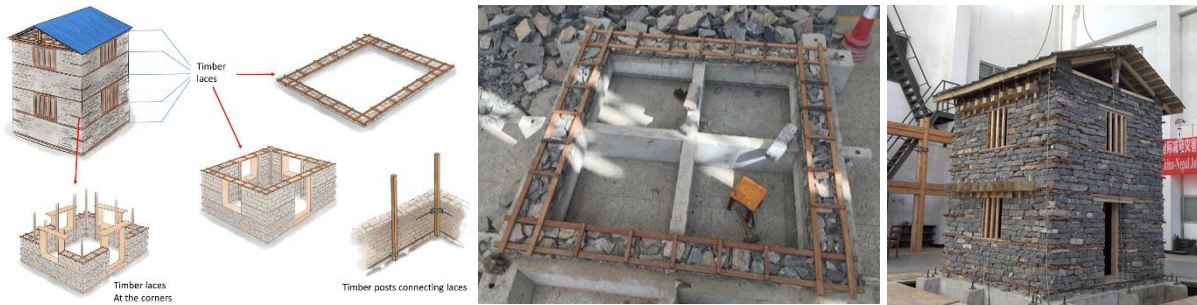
Shake table test of timber-laced dry stone masonry structure [72]
